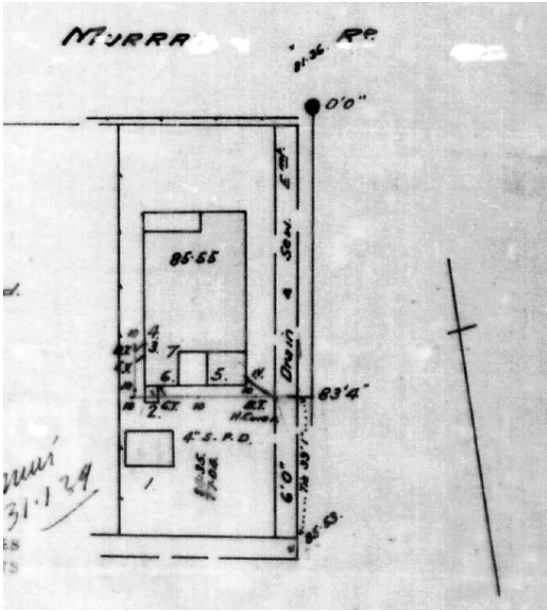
Plan of the property with footprint of the house and outbuilding, 1928 (Source: MMBW Plan of Drainage No. 165960.
